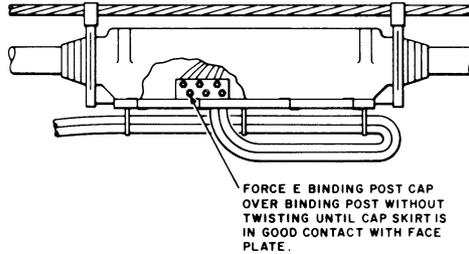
E Binding Post Caps Placed in 49-Type Cable Terminal
